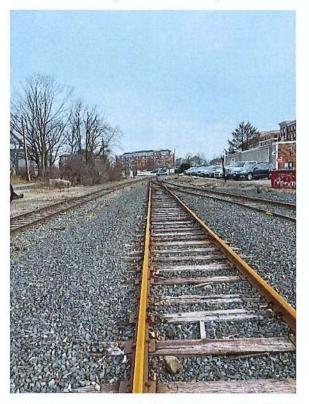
Railroad tracks looking northwest. Taken 1/19/23
